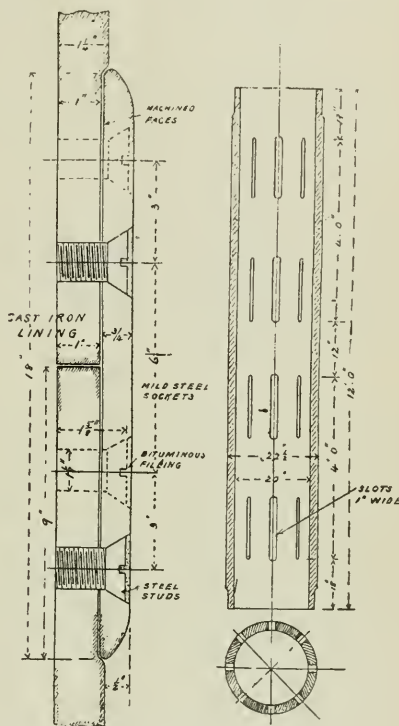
Detail of Joint in Lining Tubes and Sleeves
